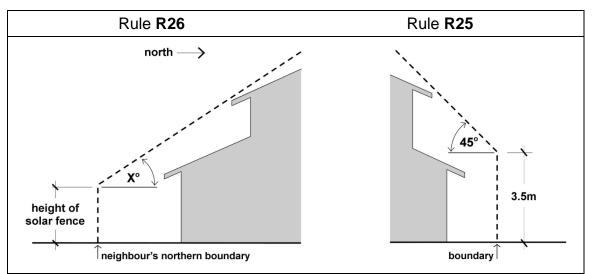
Typical building envelope for rule R25 and solar building envelope for rule R26
